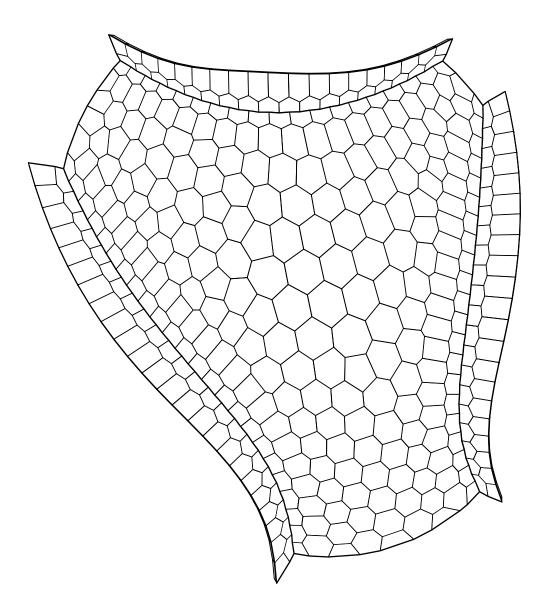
Top view, scale 1:200. Image source: ICD/ITKE, University of Stuttgart
